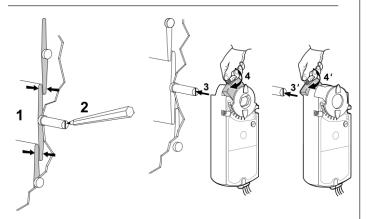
Mount the Actuator to the Shaft. Go to Figure 9 to Complete the Mounting.
